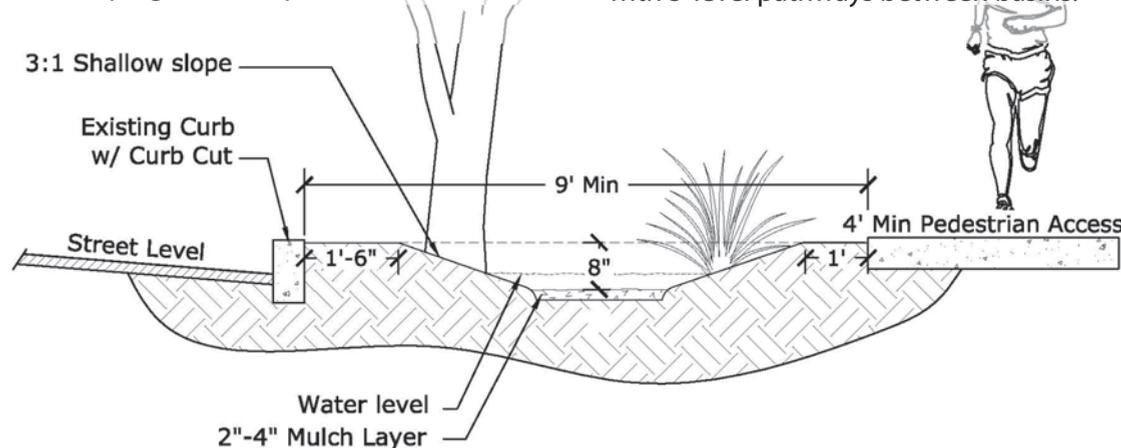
Typical cross-section of a basin with sloping sides, showing typical setbacks for a site on a residential street with on-street parking. For plan view see Appendix.
